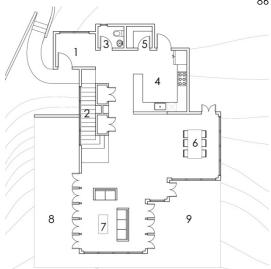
First Floor Plan - 1. Entry 2. Stairs 3. Powder Room 4. Kitchen 5. Pantry 6. Dining 7. Living 8. Deck 9. Outdoor Dining
